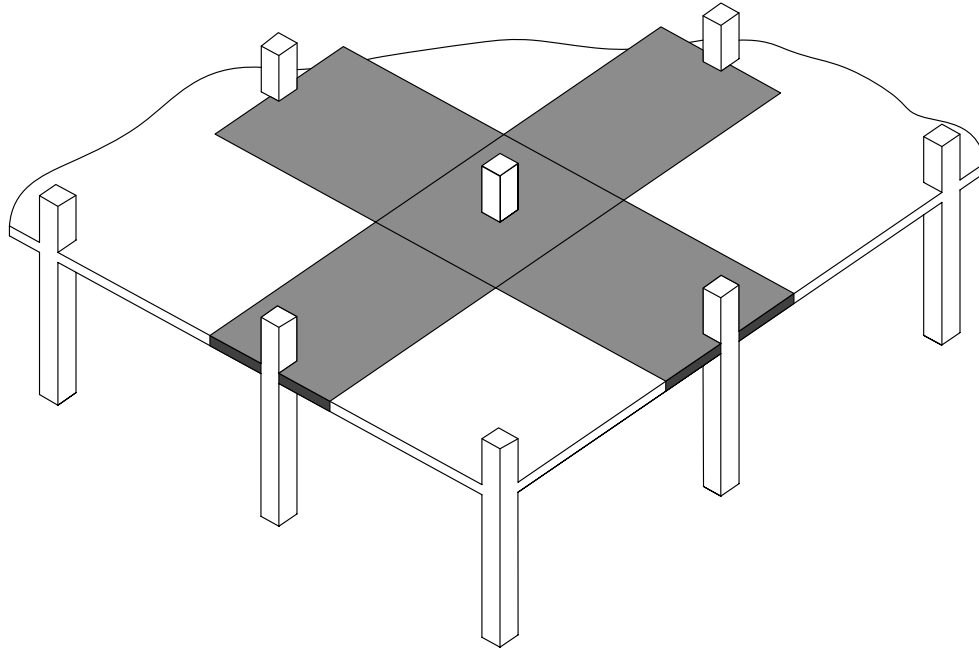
Improvement of the design of floor slabs in the interior column strip regions only, when interior column is removed (provided continuous bottom and top reinforcement).
